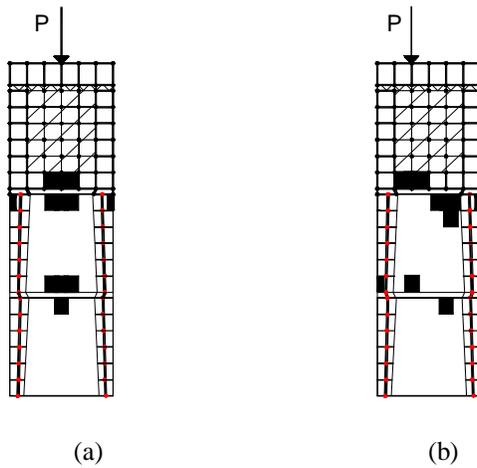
Cracking pattern of bond-beamed hollow masonry walls
